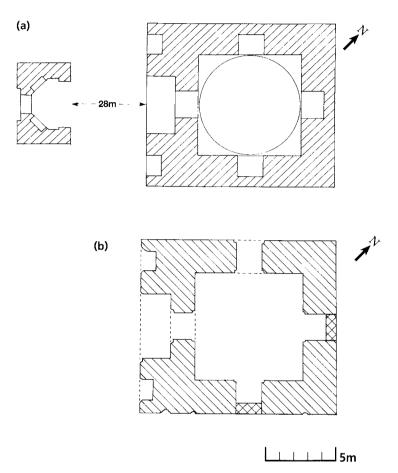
Plans of the Timurid pavilion or Köshk Imaret [26].
